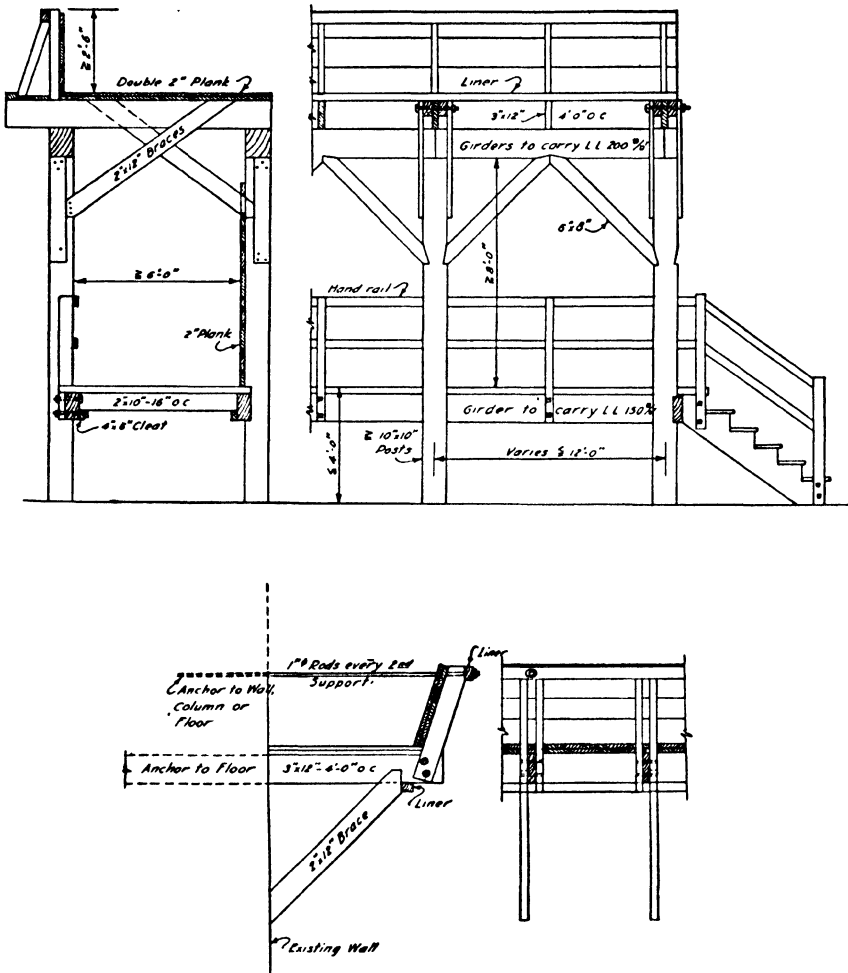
Sidewalk Bridge and Overhead Roof.
